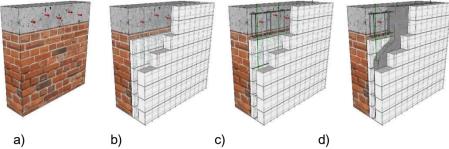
Installation phases of the Insulated Concrete Formwork technology:
